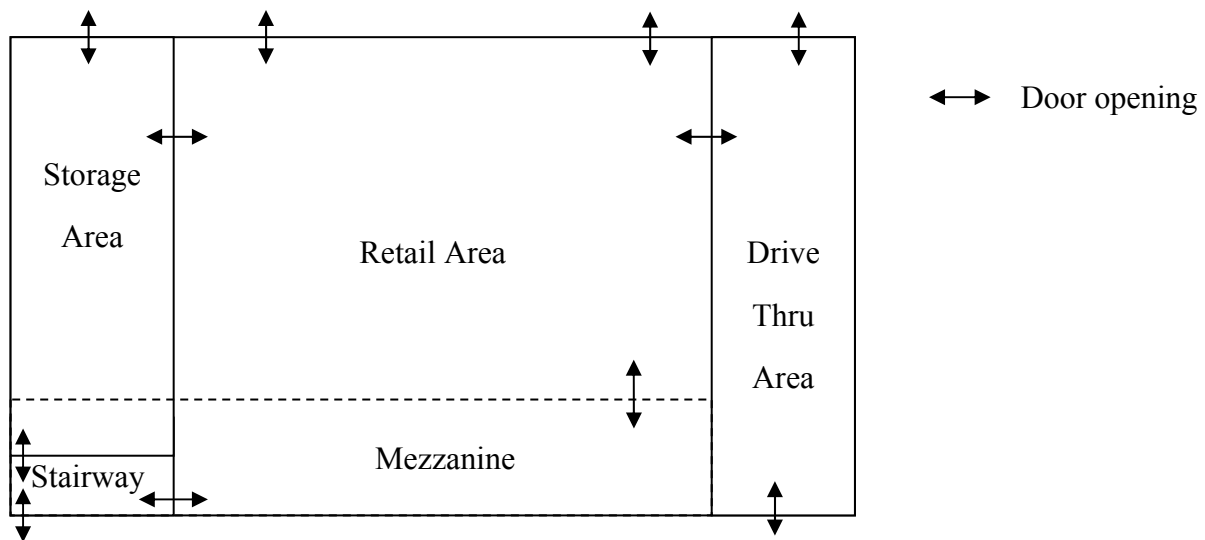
Case Study Building One (Retail Warehouse) BRANZFIRE modelling
